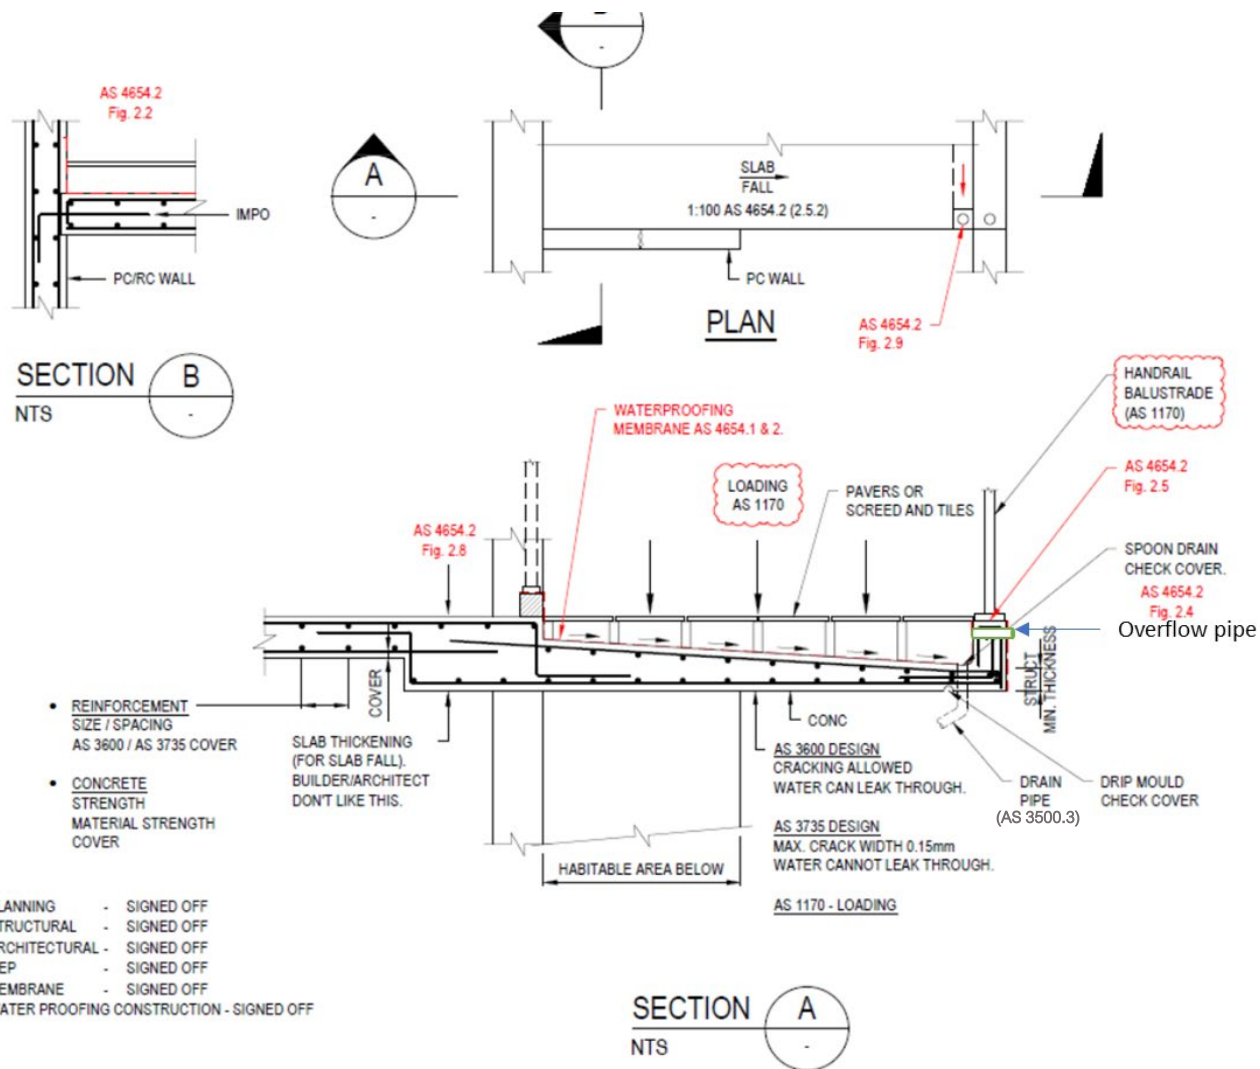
Apartment concrete balcony design and construction: Suggested inspection checklist
